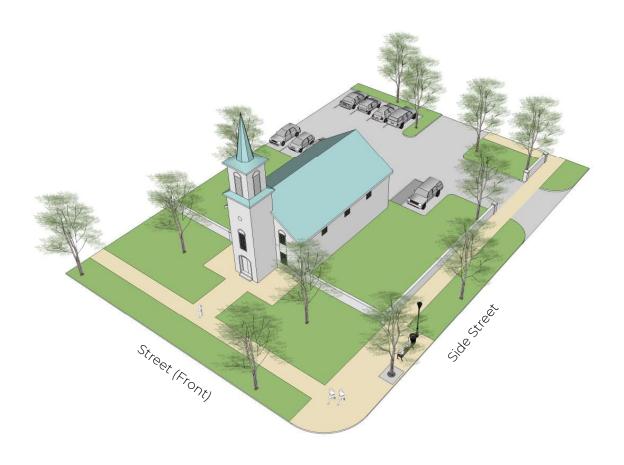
Illustrative example of buildings and site arrangement in the Civic Zone.
